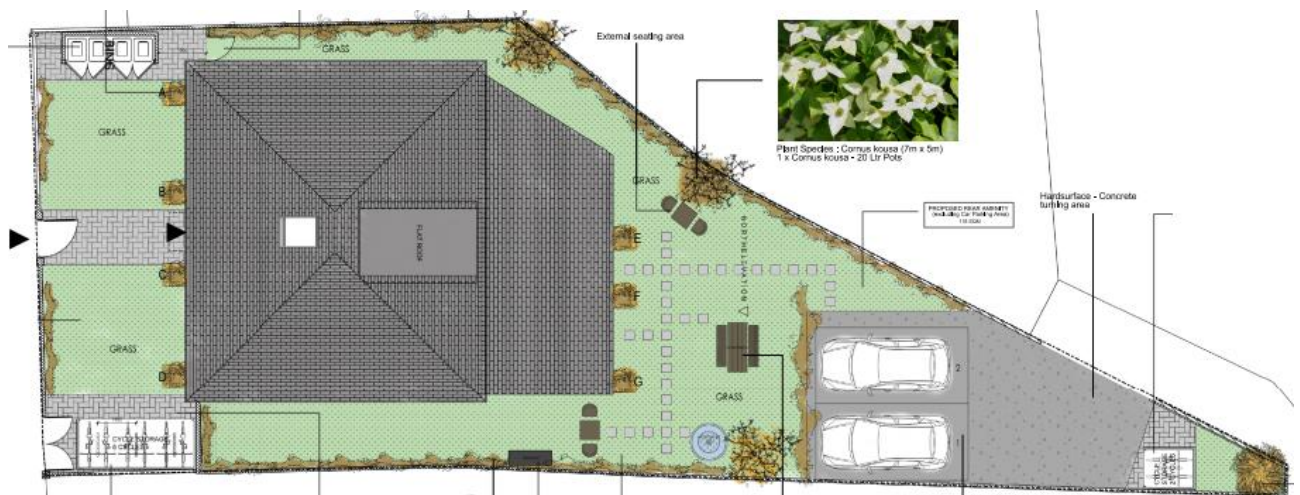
PROPOSED site layout landscaping plan extract (drawing LAN-001)
